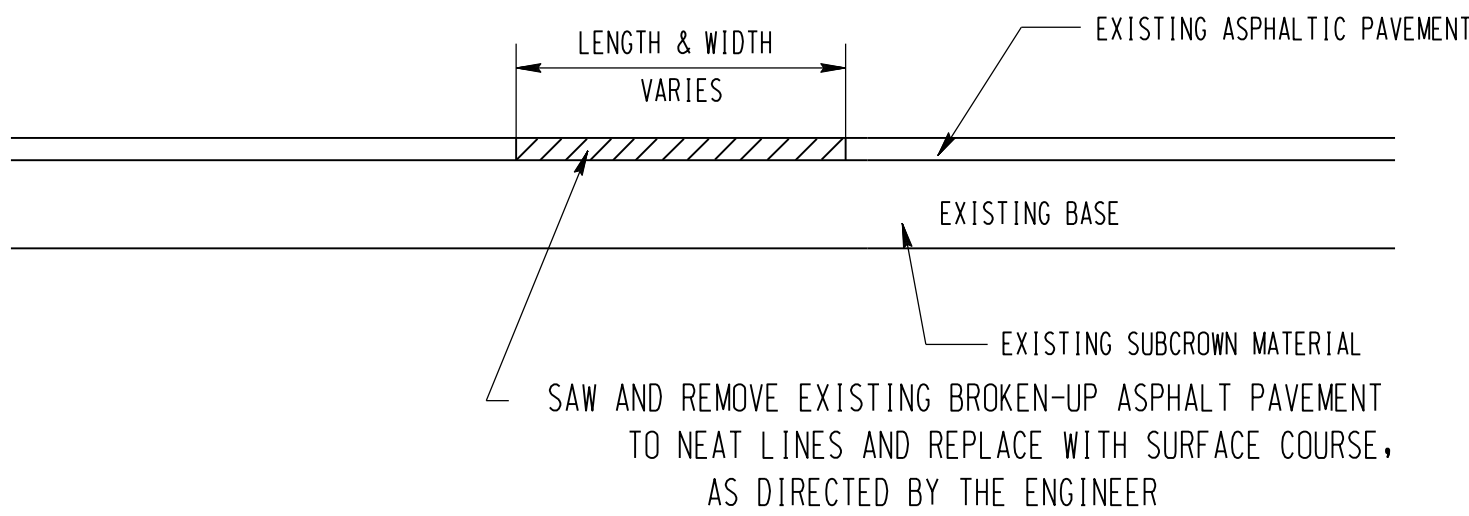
DETAILS OF REPAIRING EXISTING PAVEMENT PRIOR
